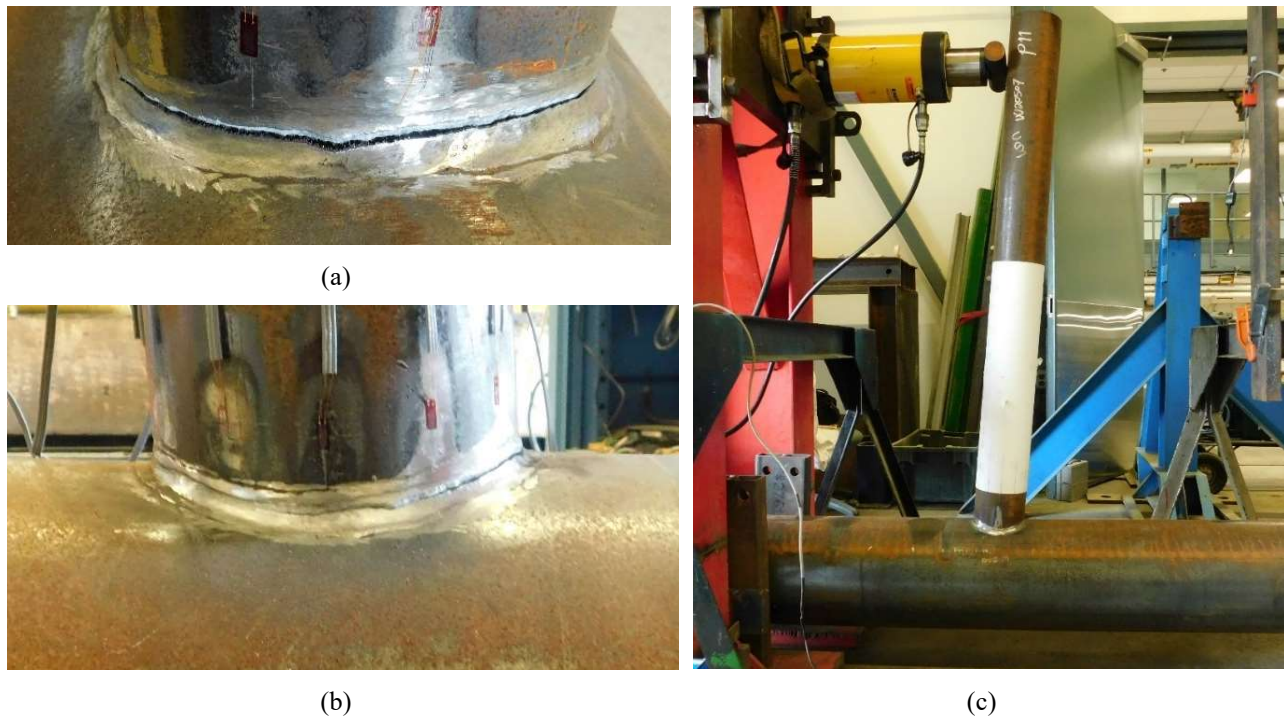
Failure of T273-127-1 (a) weld fracture, (b) chord deformation and (c) branch deformation
